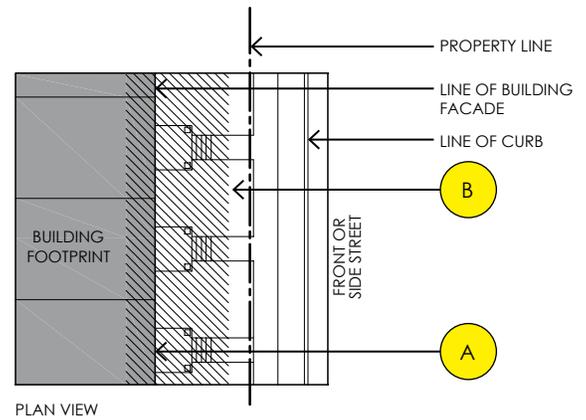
ROWHOUSE BUILDING WITH PROJECTING PORCH
